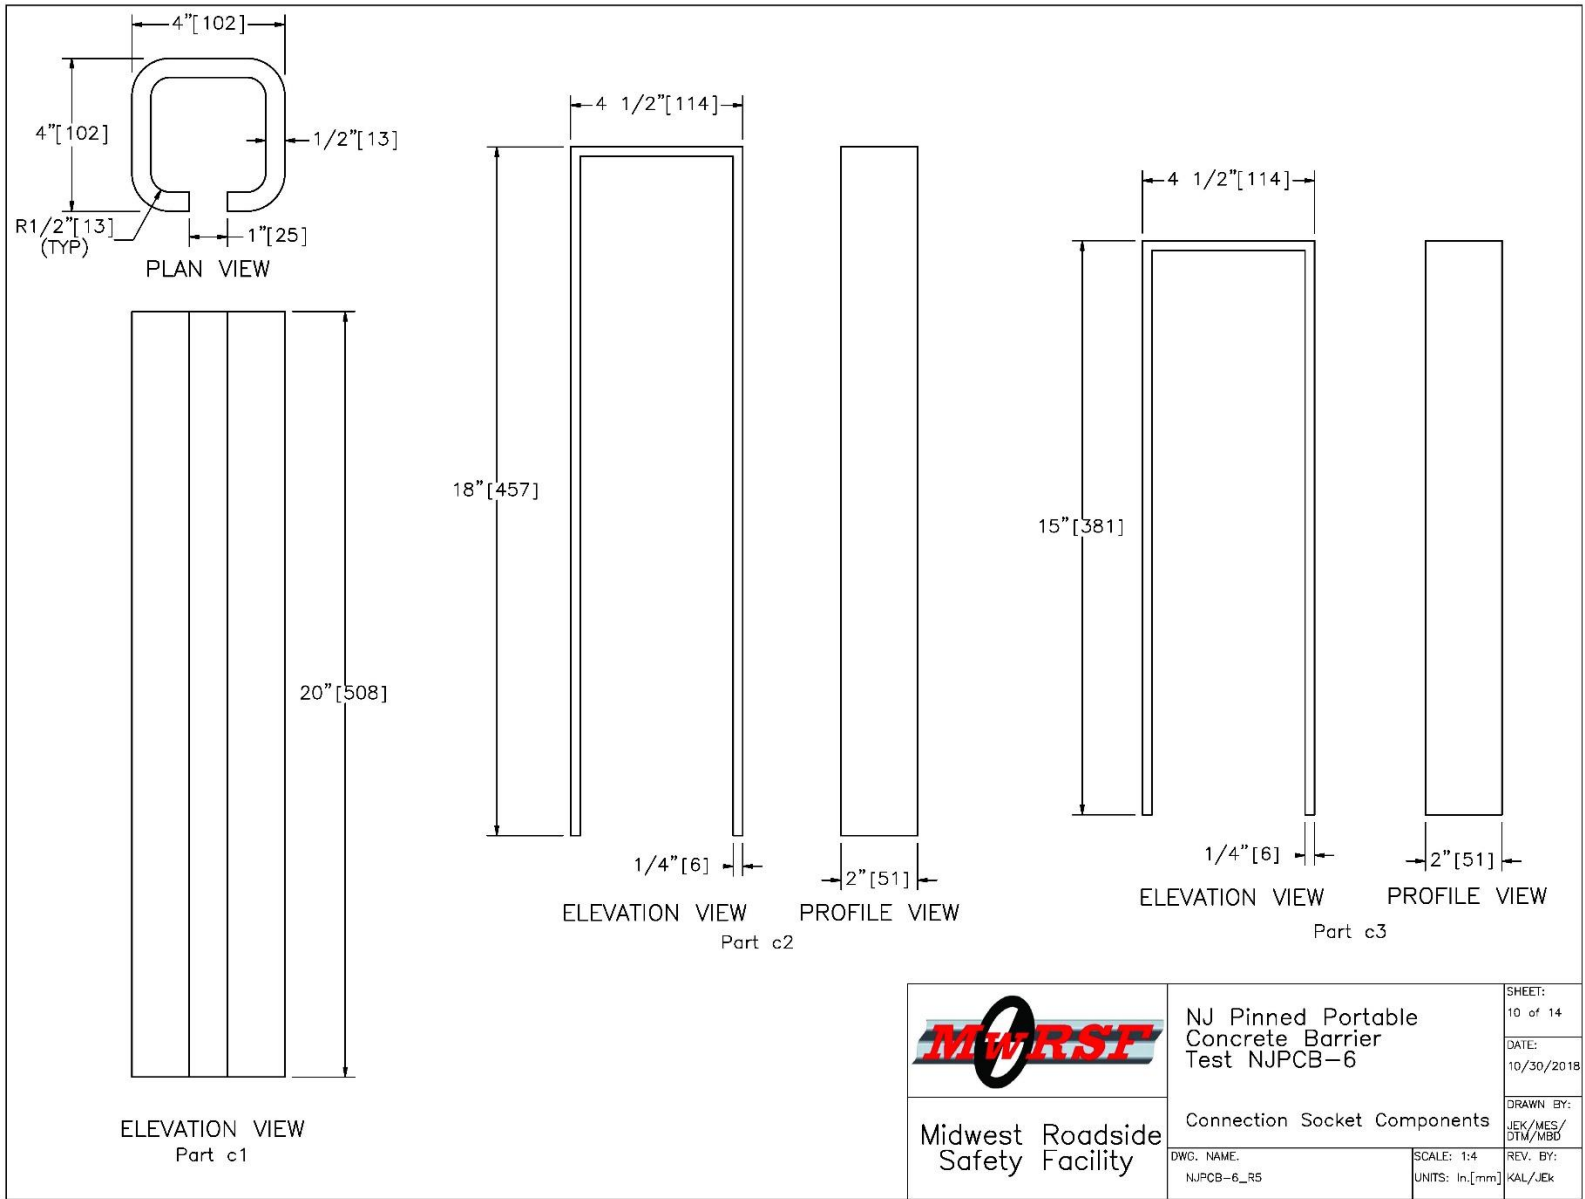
PCB Connection Socket Component Details, Test No. NJPCB-6
